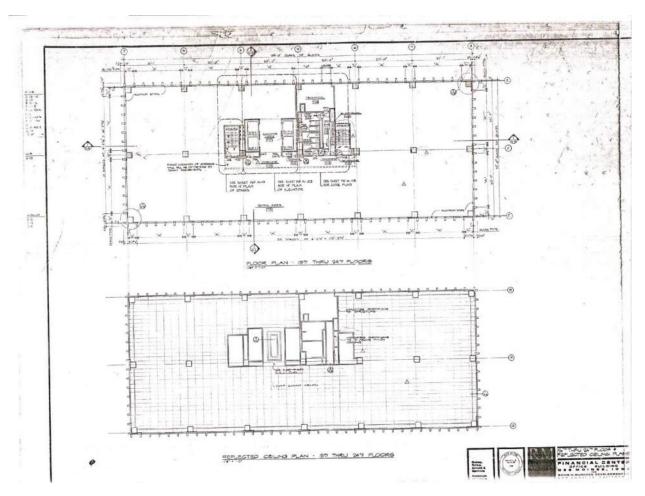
Historic drawings of typical tower floor shell and core plans for fourteenth floor and above, oriented with plan north at left. Undated; bottom of sheet is cut off. (Financial Center Office Building drawings, Russell McCaleb, architect, Guirey, Srnka, Arnold & Sprinkler associated architects).
